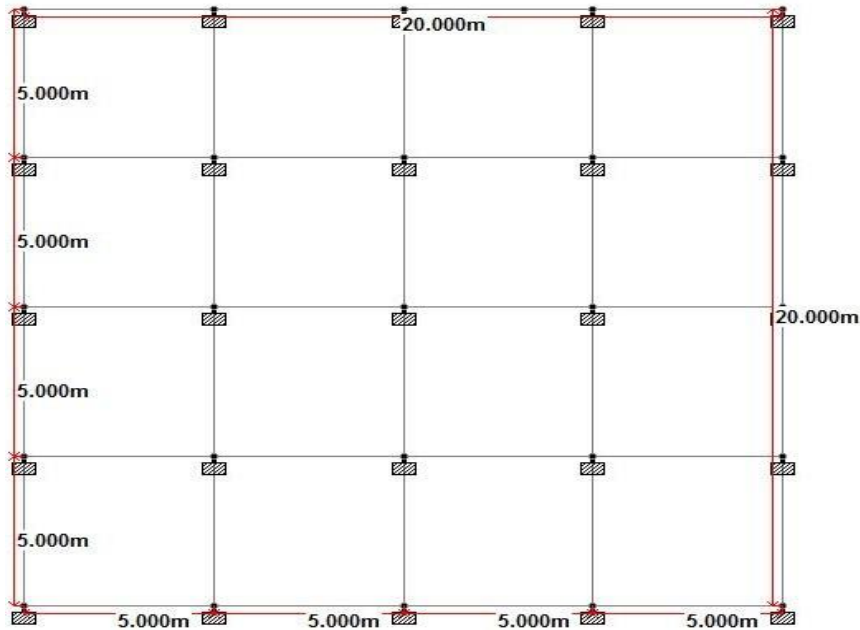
Structural Floor Plan Of Steel Concentric Frame
